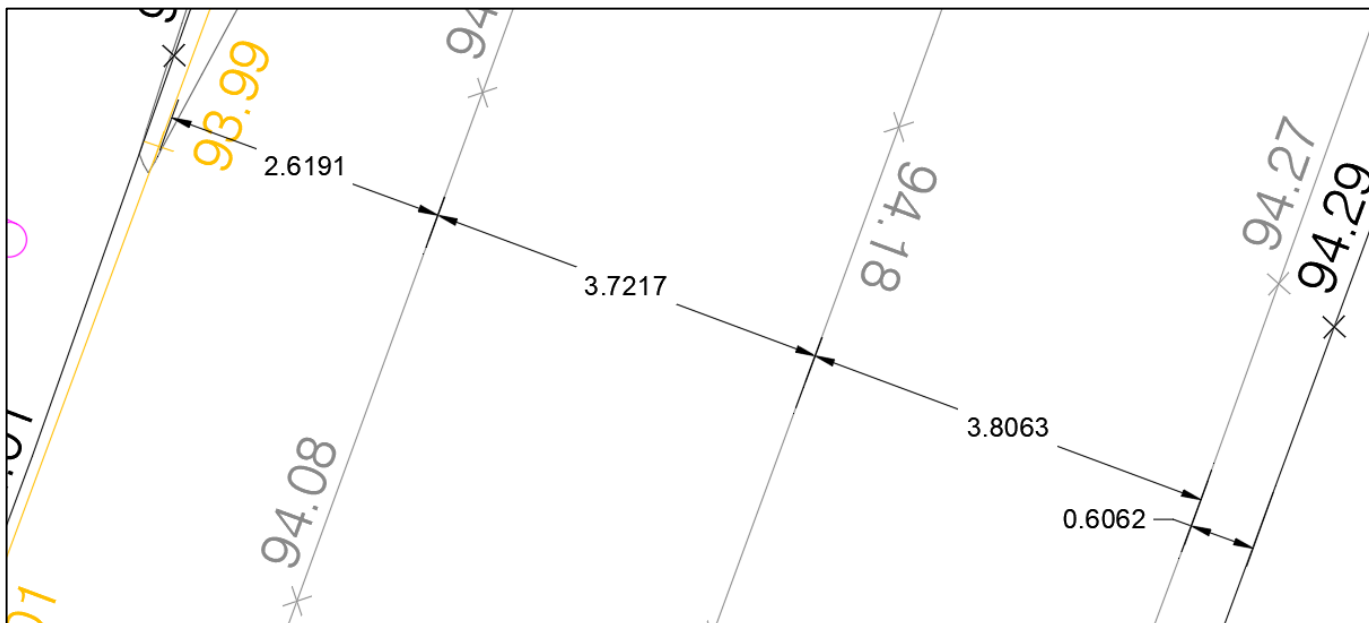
Cross Section of N11 mainline approach to L5046 Johnstown entrance
